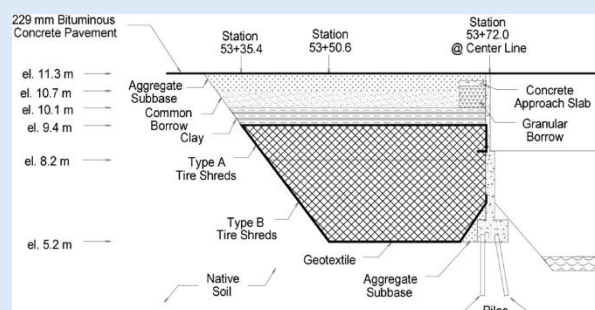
Longitudinal cross-section of the bridge abutment (Humphrey et al., 2000).
